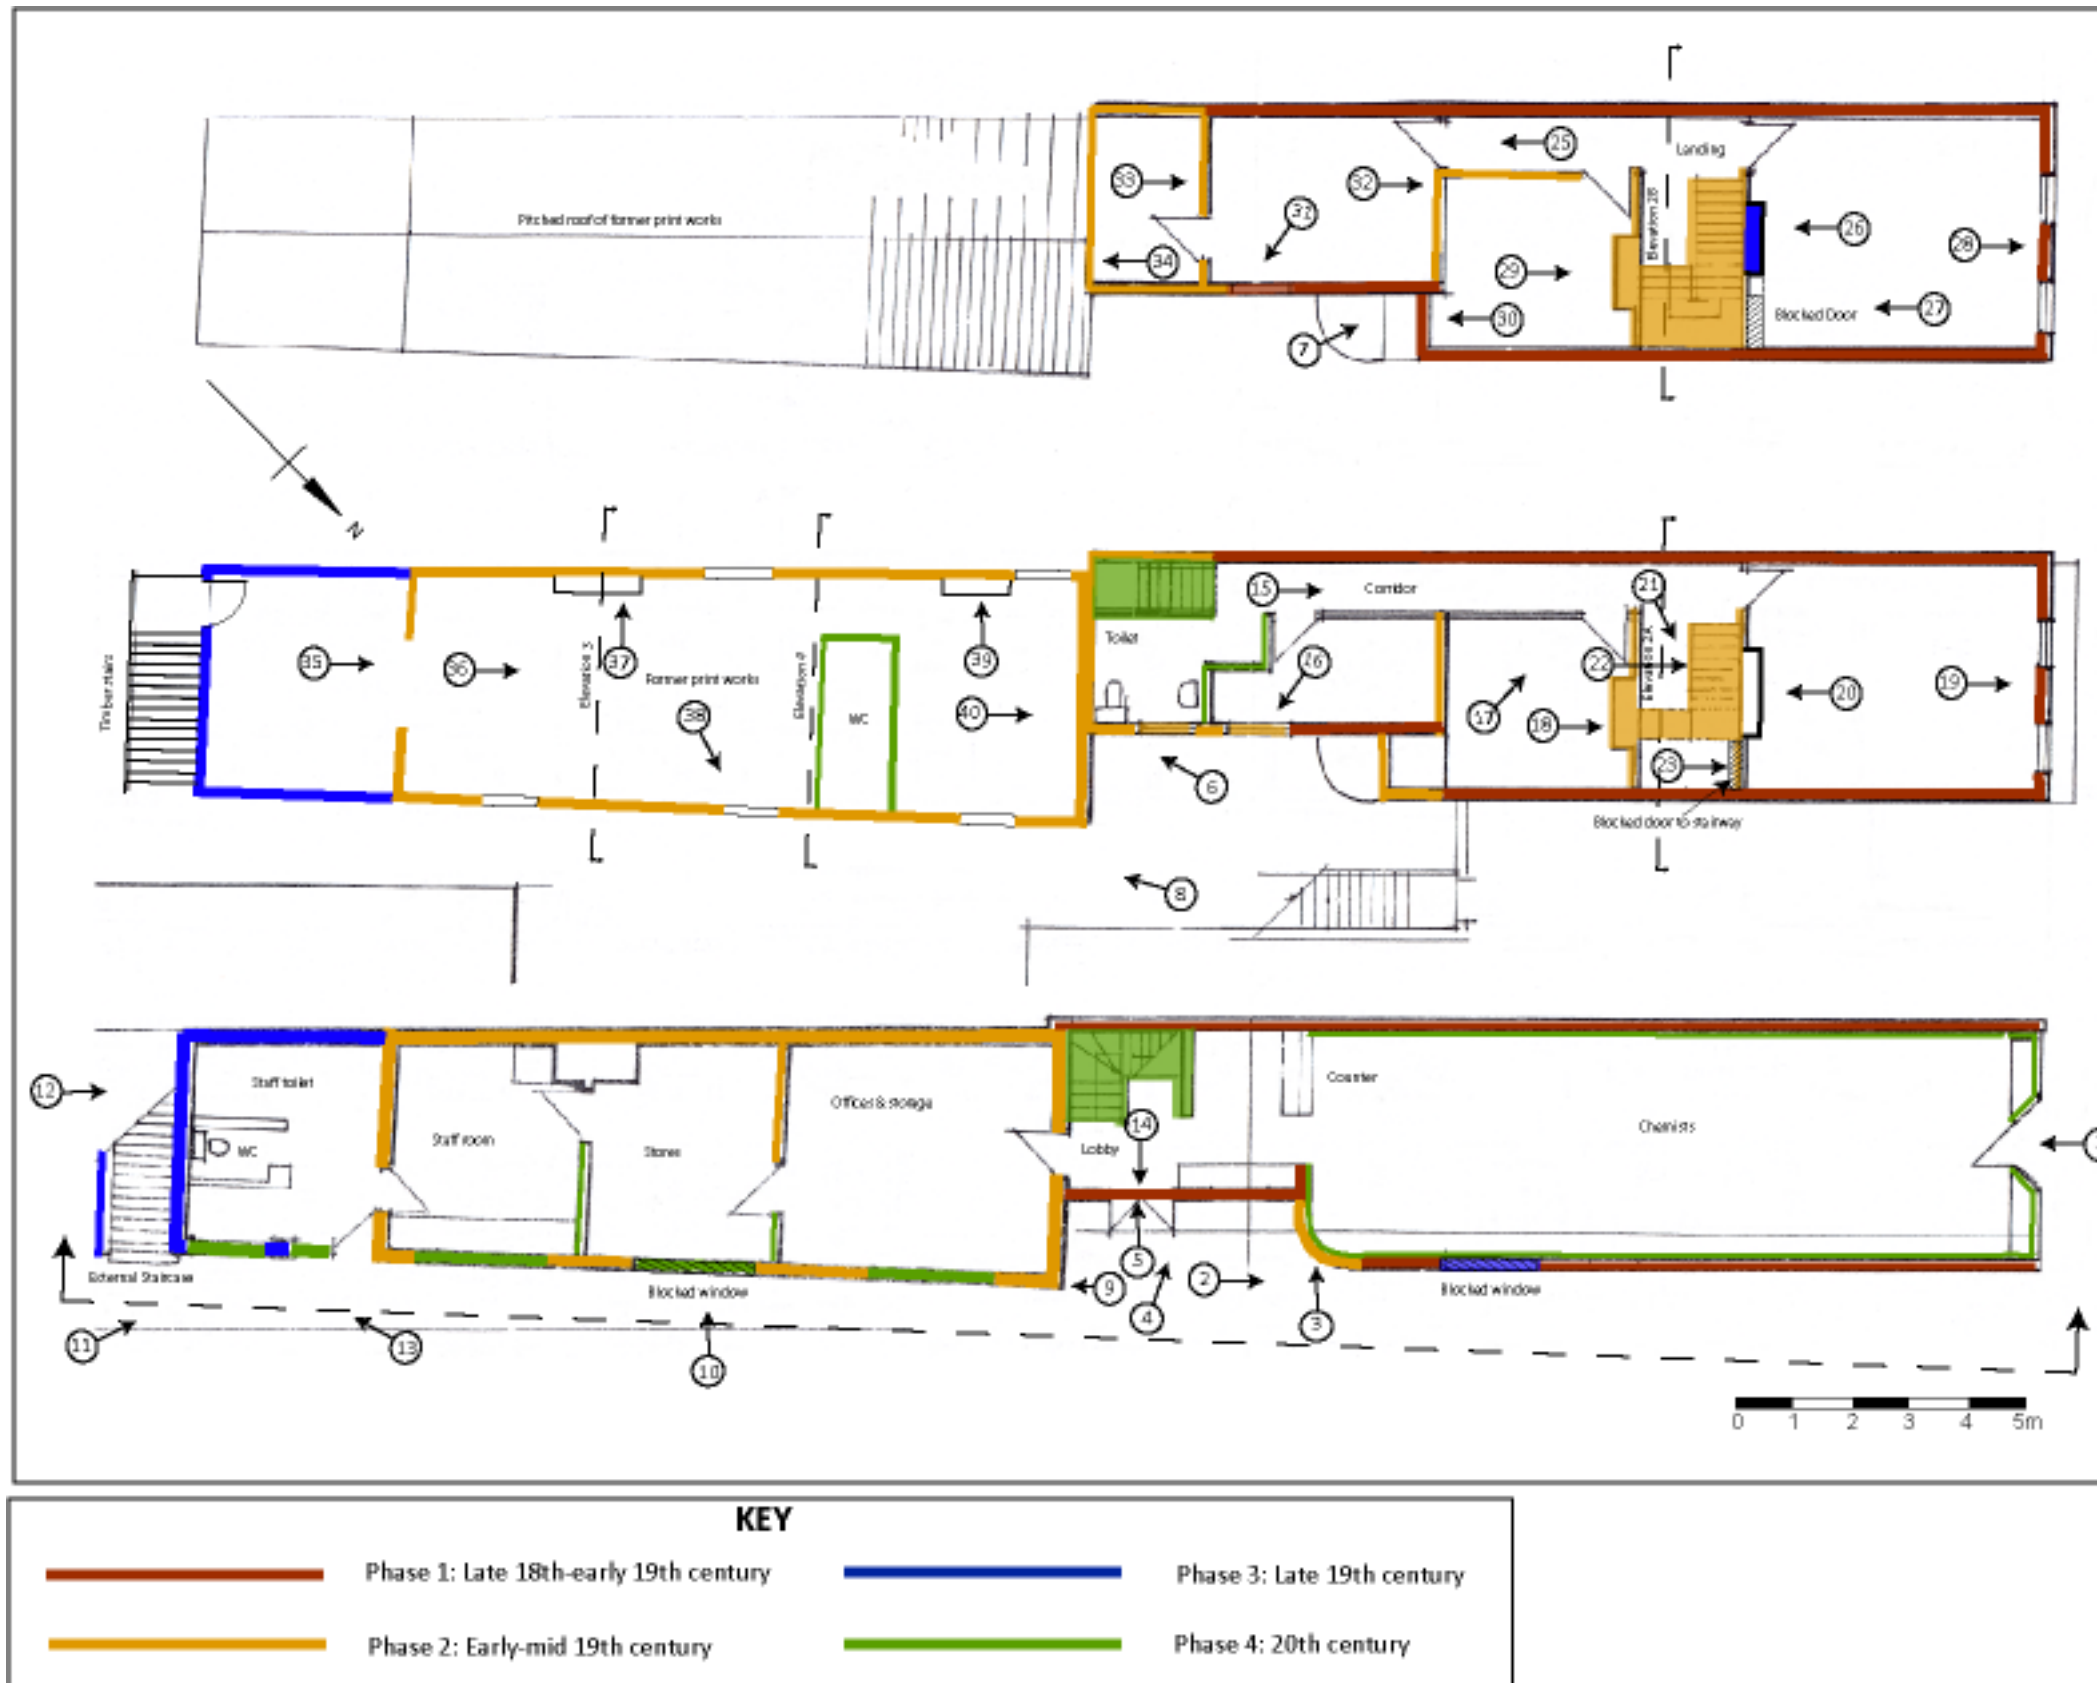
Phased plan of house and two-storey outbuilding (former printing works) at No. 11 Load Street
